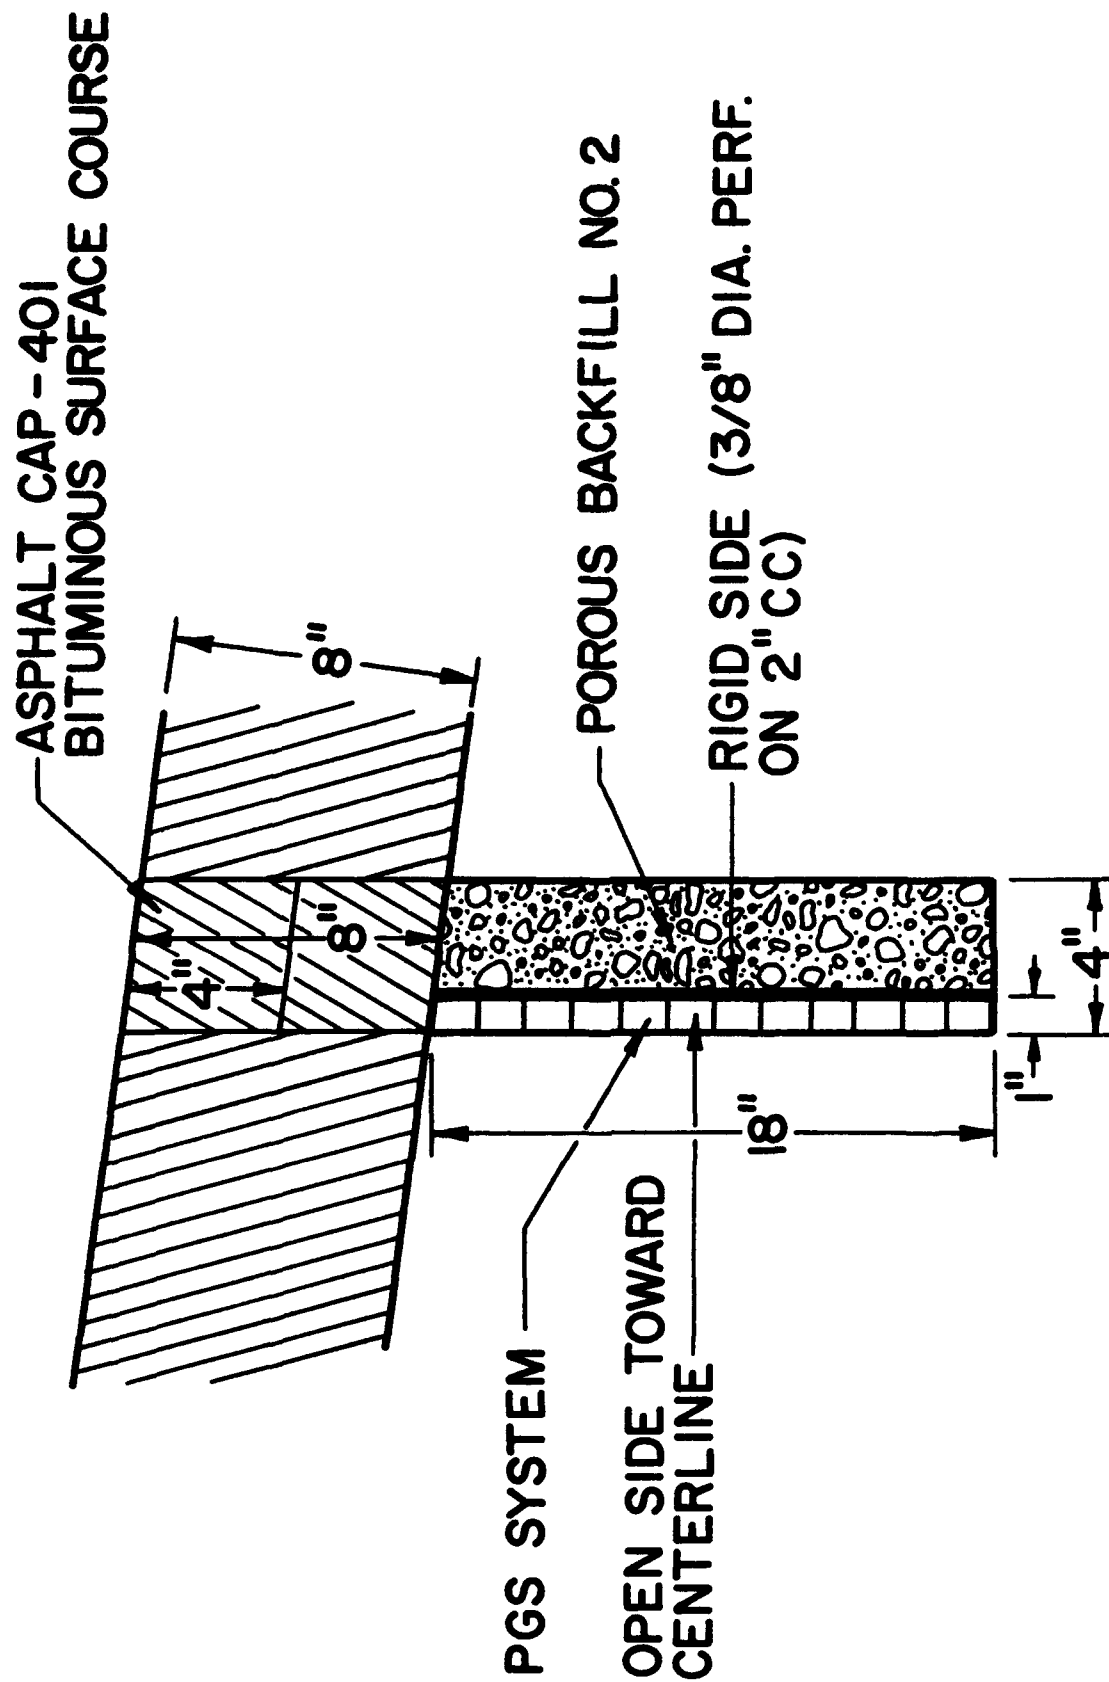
Installation Details of 18 in. PGS System in Runway 09-27.
